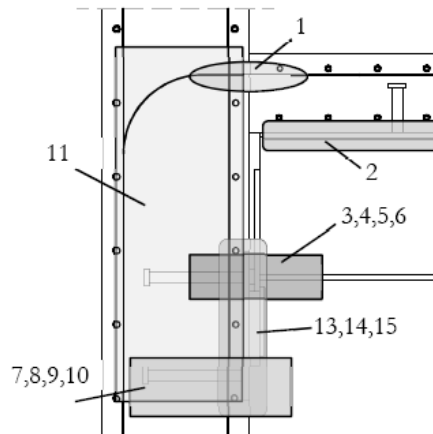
Joint component model for the composite beam to reinforced concrete wall joint
